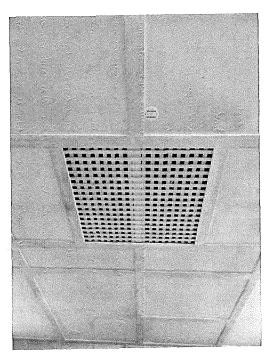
ACMA Facility Main Building interior wood frame and panel ceiling with air vent.
